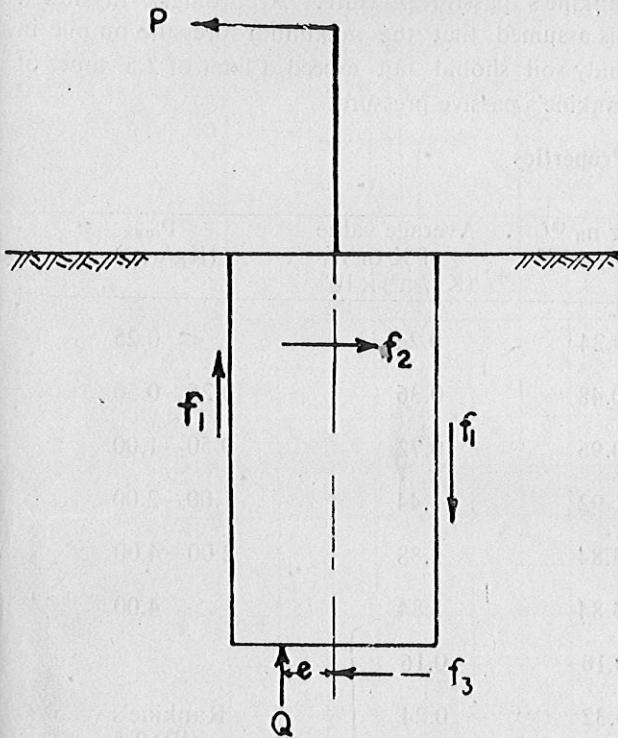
FORCES ACTING ON THE BLOCK FOUNDATION
